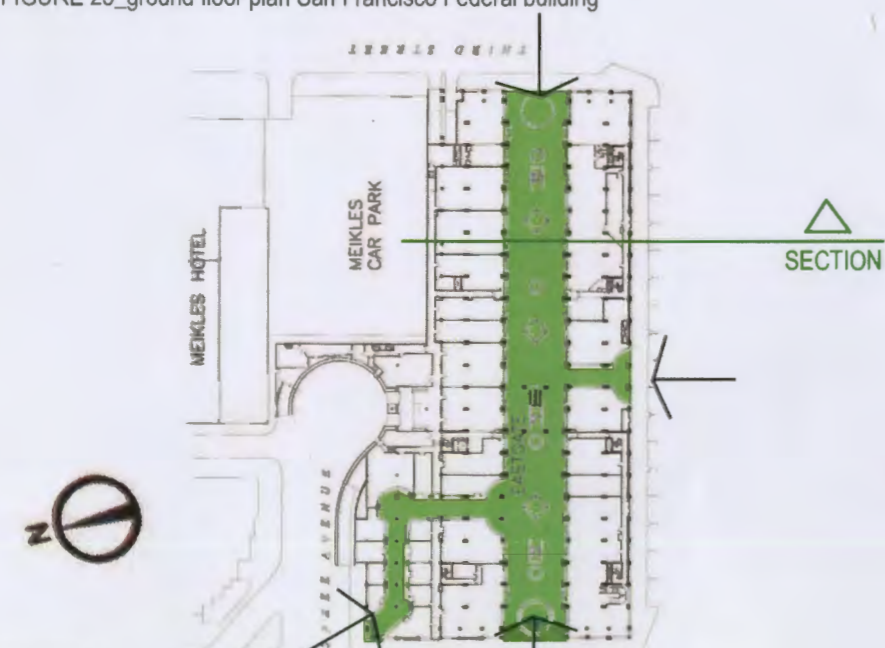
ground floor plan Eastgate Centre, Harare
